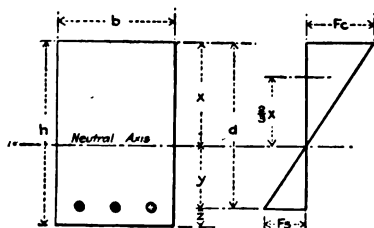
Thacher's Formula, Rectangular Beams, Single Reinforcement.
